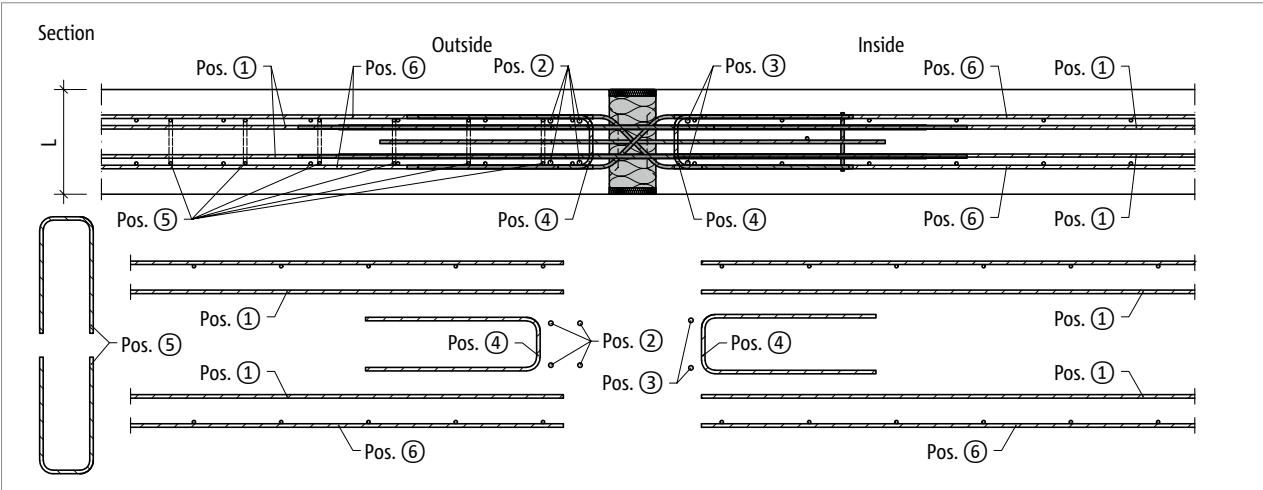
Schöck Isokorb® T type W: On site reinforcement; layout
